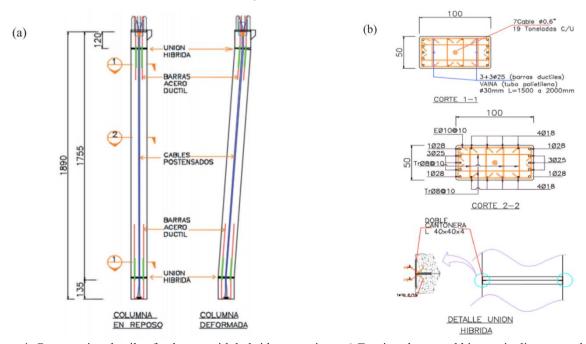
Construction details of columns with hybrid connections, a) E-axis column and kinematic diagram and b) cross sections and details
